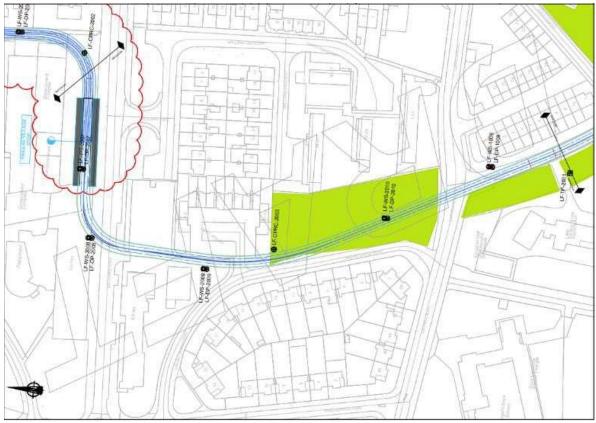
GI Plan Sheet 7, Luas Finglas (Barry Transportation and Eegis).
